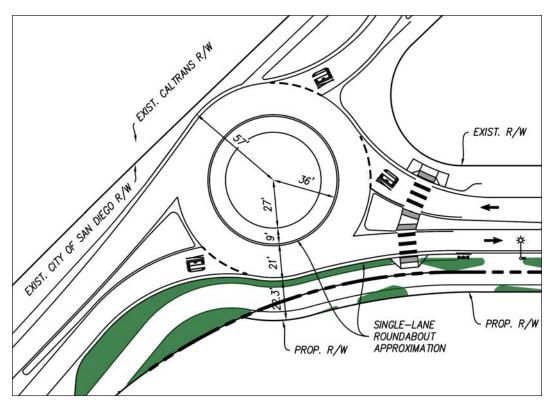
Roundabout Concept at Hancock Street and Kurtz Street
